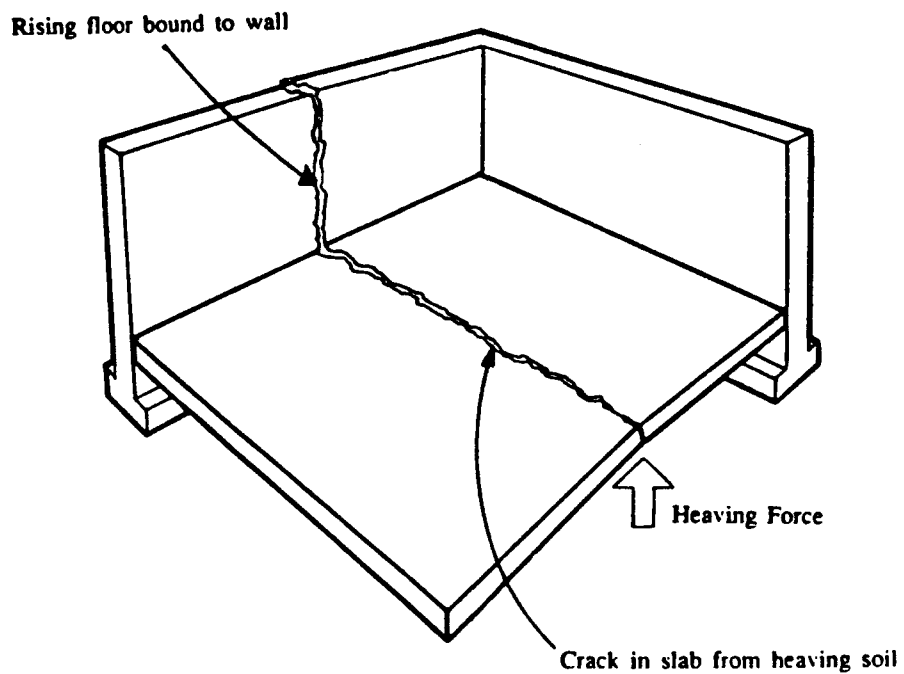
Heaving soil under a floor slab causing cracks in concrete wall and slab.
